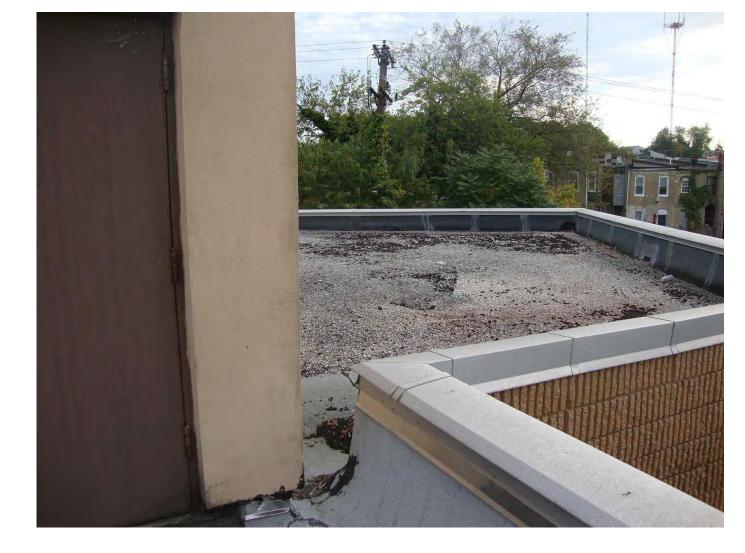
STAIR TOWER / PARAPET WALL
